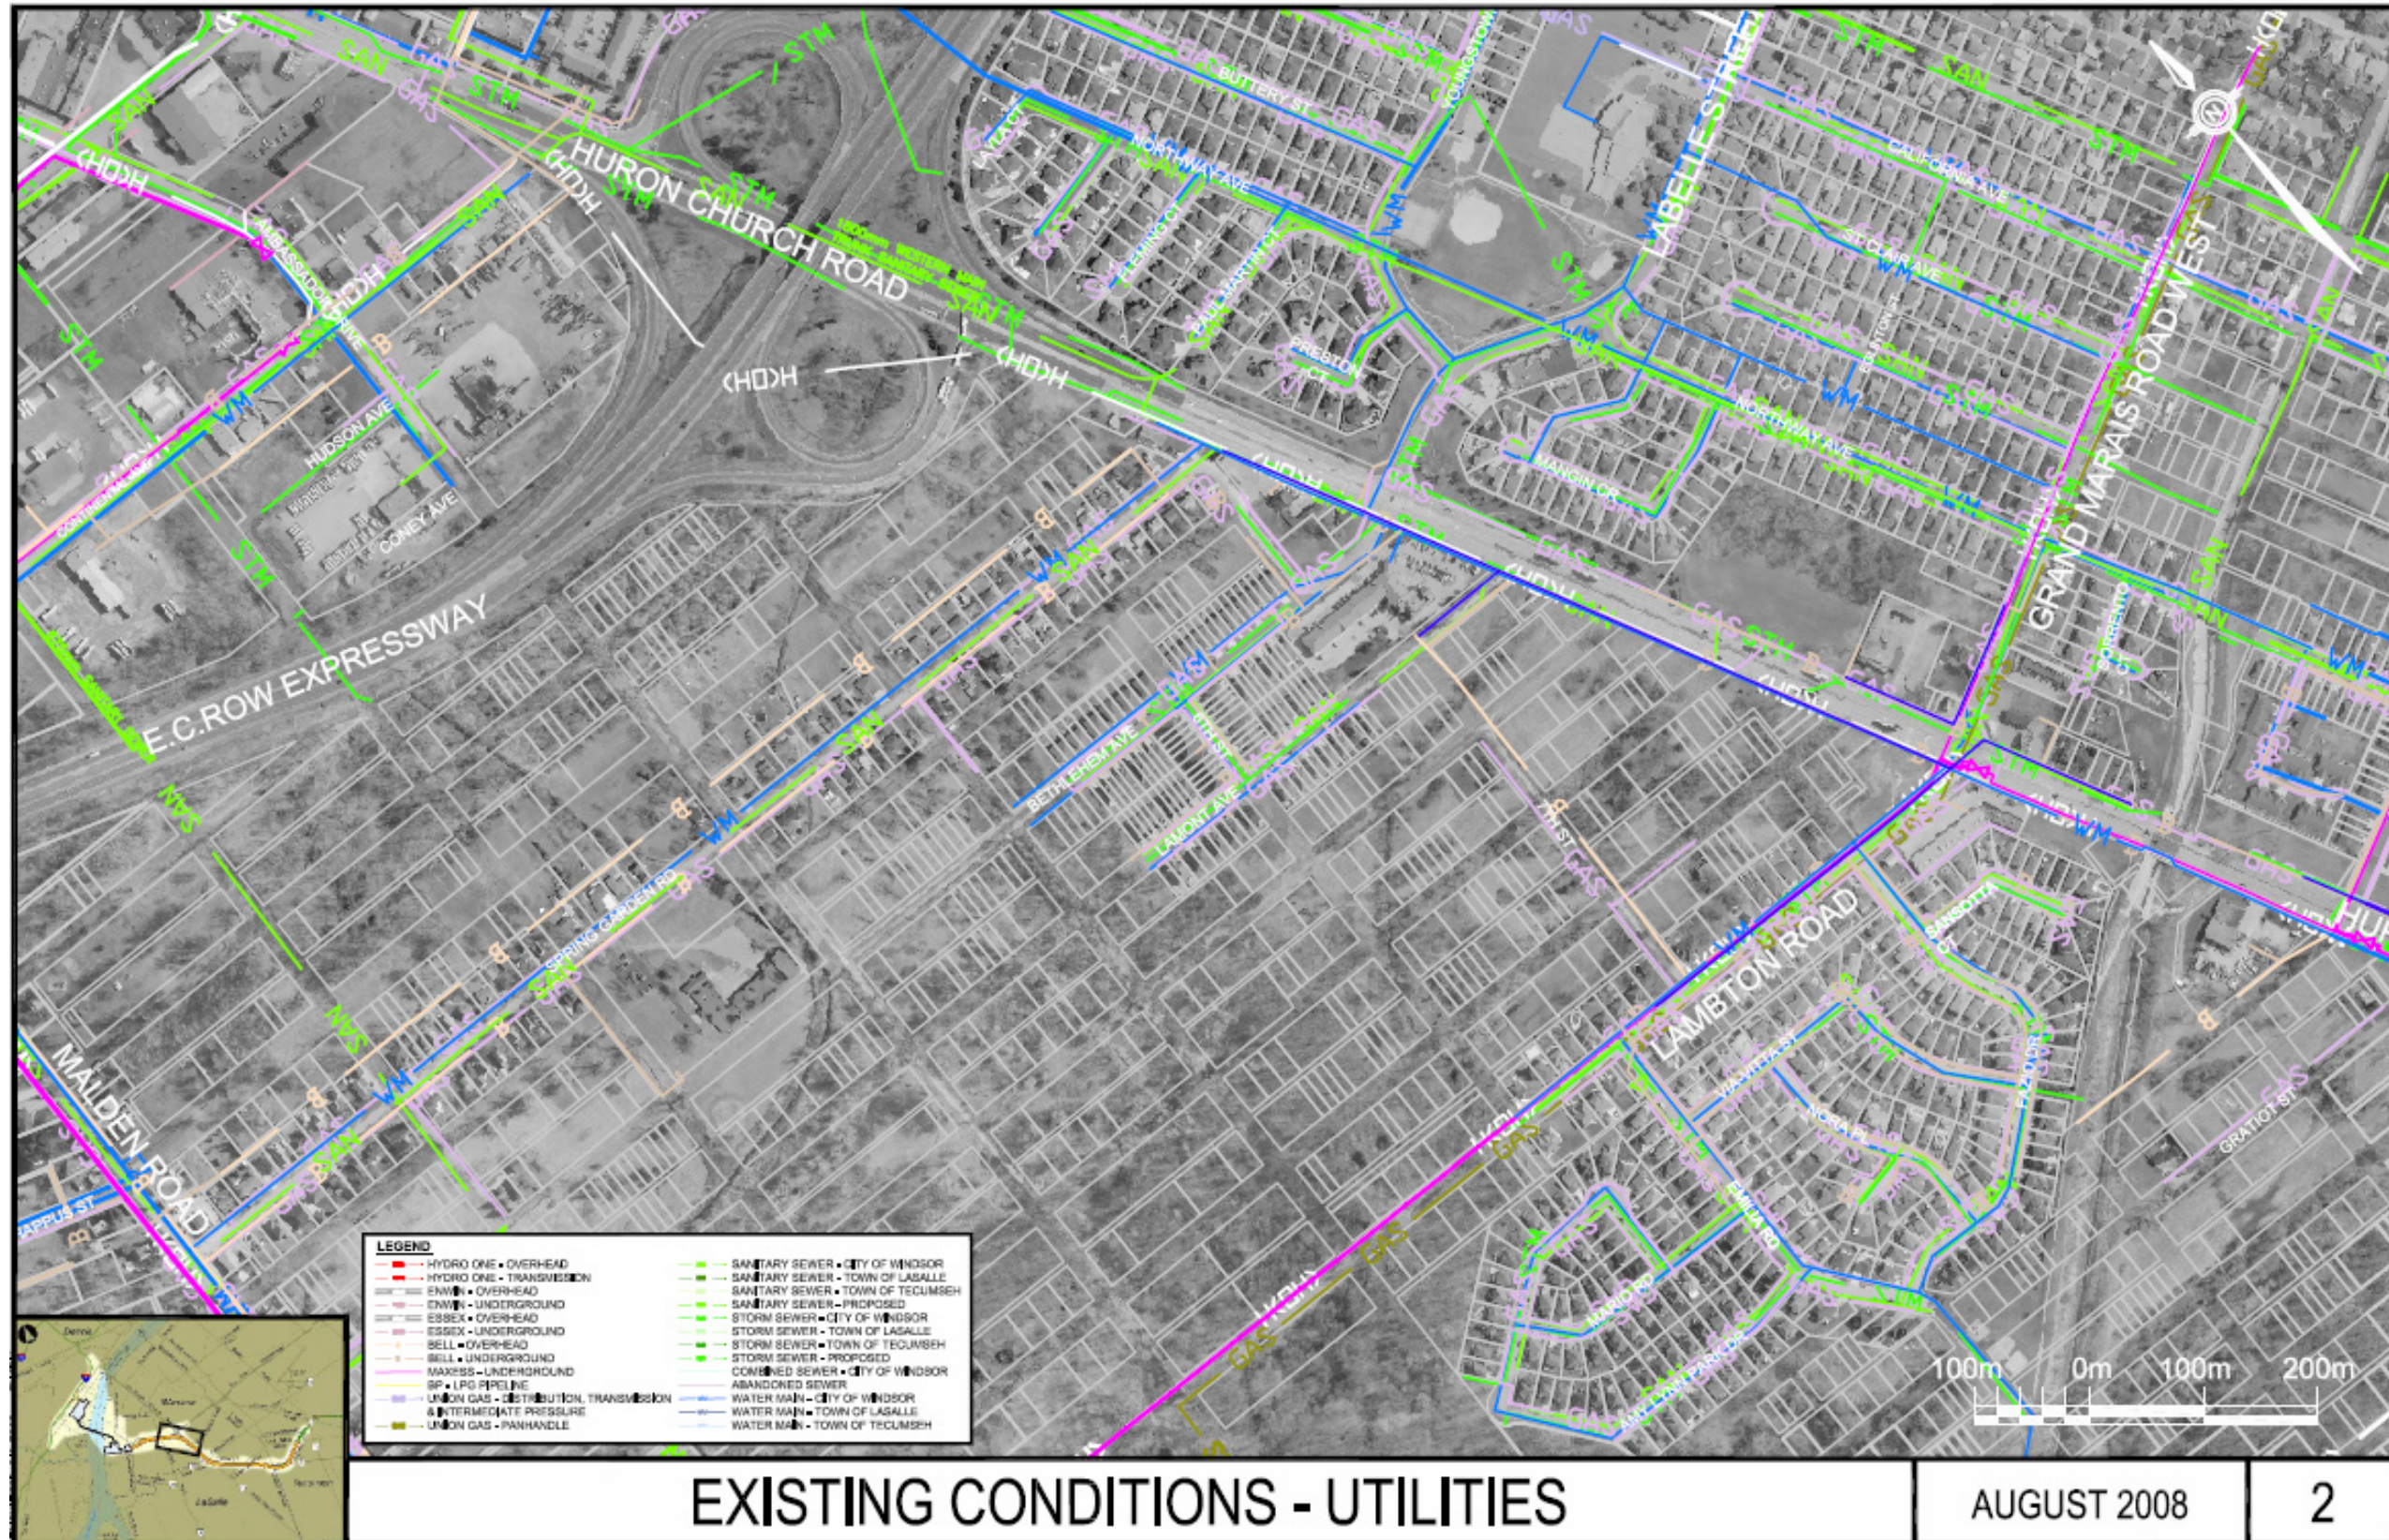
C – EXISTING UTILITY CONDITIONS (HURON CHURCH ROAD CORRIDOR / HURON CHURCH LINE)
